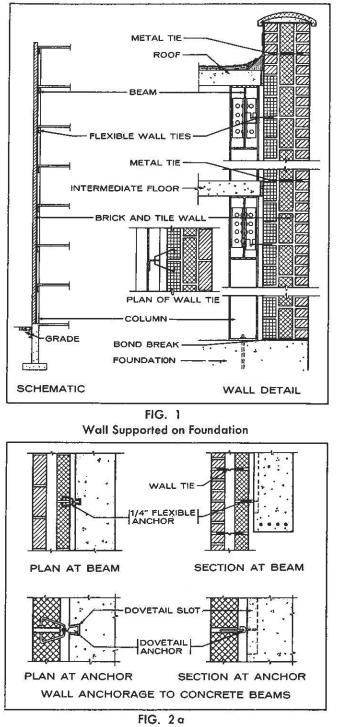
Masonry Wall Details: Technical Notes on Brick Construction
